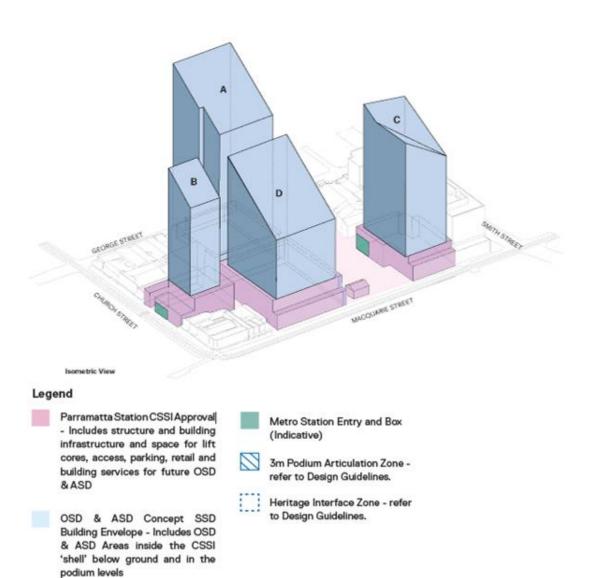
Proposed Concept SSDA development and CSSI scope
